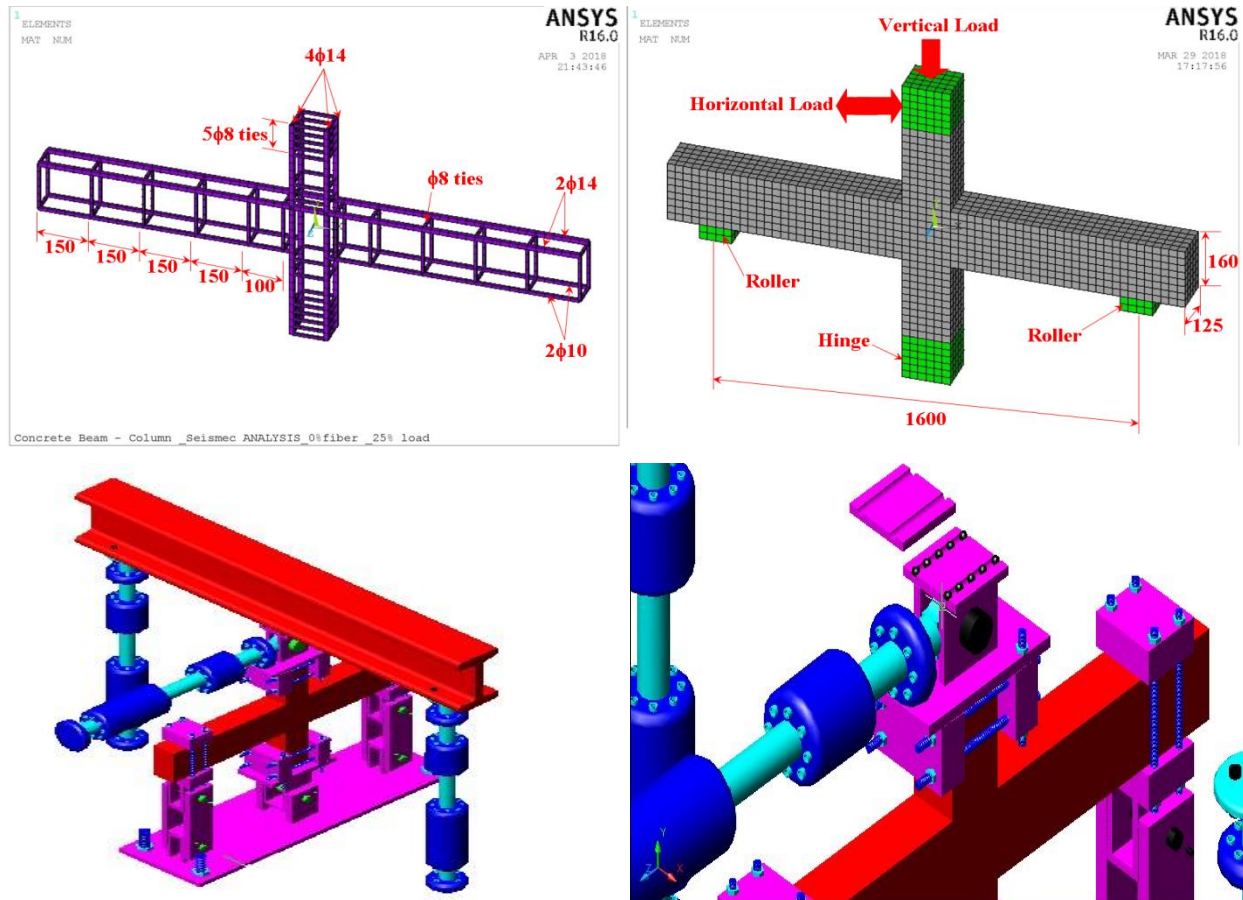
Specimen geometry, steel detailing, and schematic of applied loads setup (dimensions are in mm) [1].
